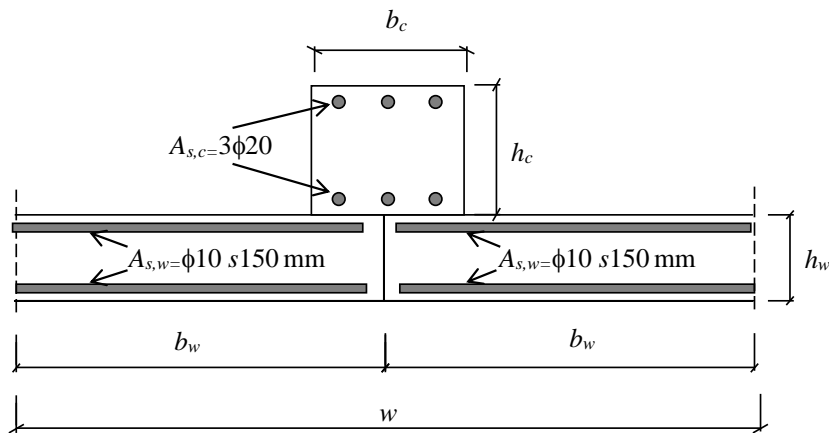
Top view of the analysed front column and wall with main dimensions and reinforcement amounts.
